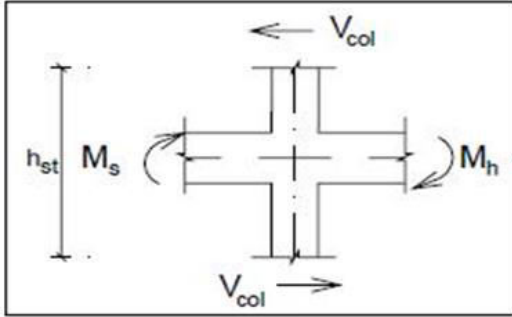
COLUMN WITH SWAY TO RIGHT [17]
